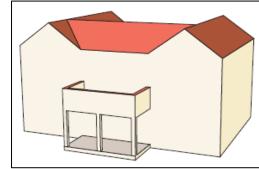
At minimum, awnings shall be provided on the primary facade of all buildings within Form Area C. (Source: Town of Redington Shores, Florida Urban Design Guidelines)
